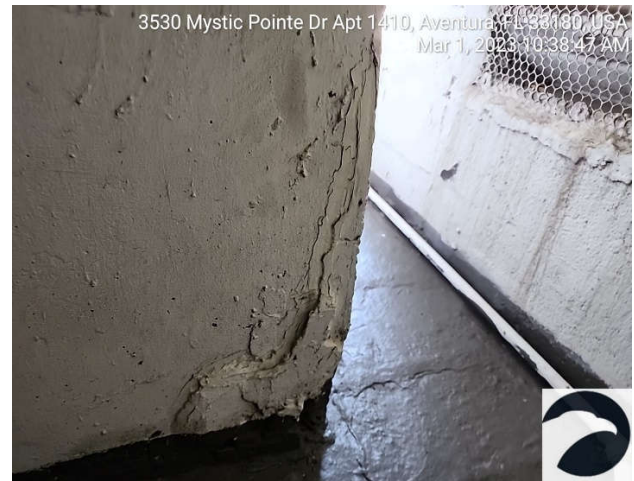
a.14 – Cracked concrete with hollow sound at column of the A/C Mechanical Room (Roof Level)
